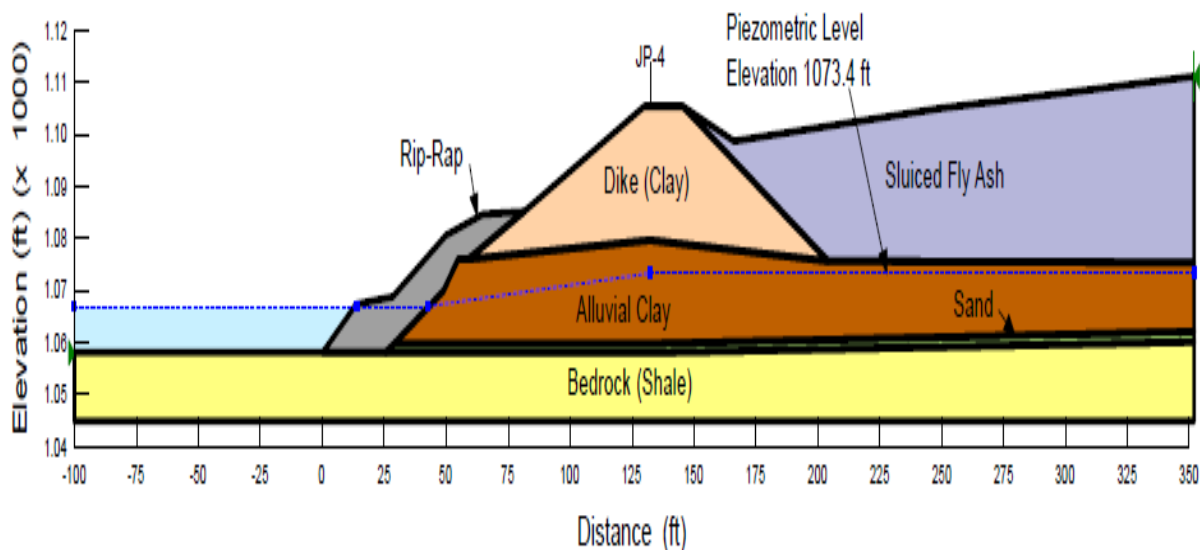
Typical Ash Disposal Area J Cross Section (West)
